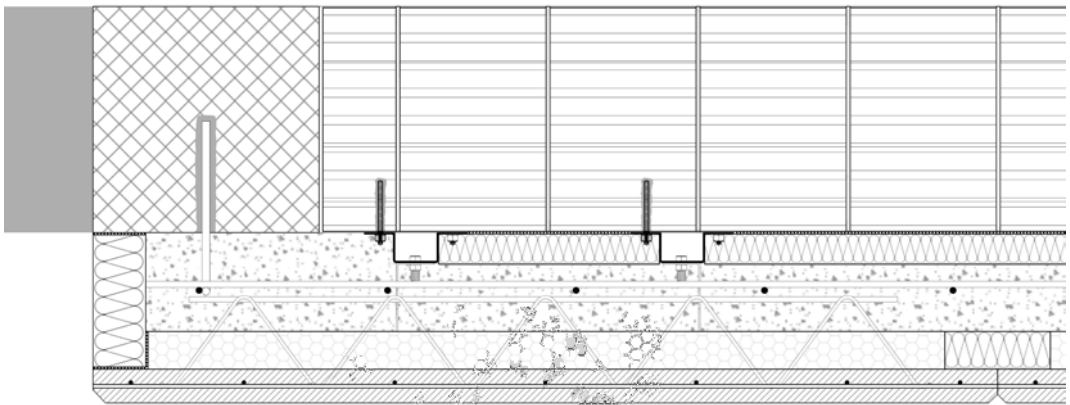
Plan section: lateral ending in presence of another building. Source: Author
